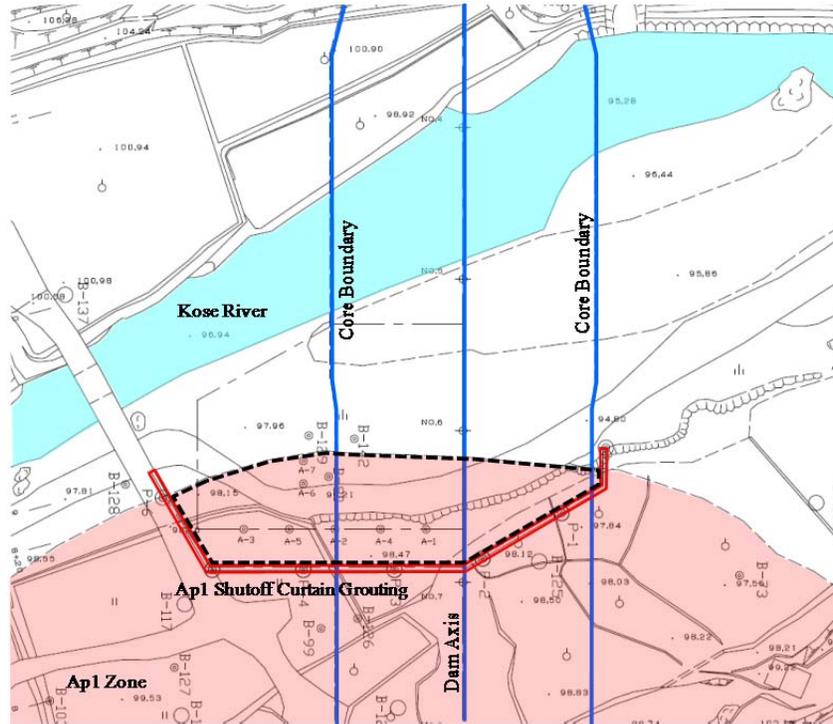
Ap1 Shutoff Curtain Grouting Plan
